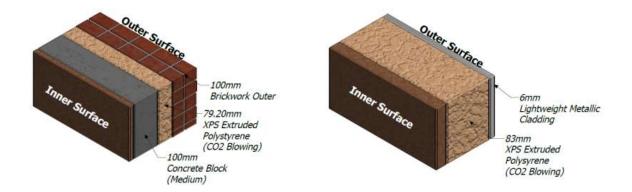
Structure of wall components (left picture. curtain wall, the right picture demonstrates timber frame wall super insulated)
